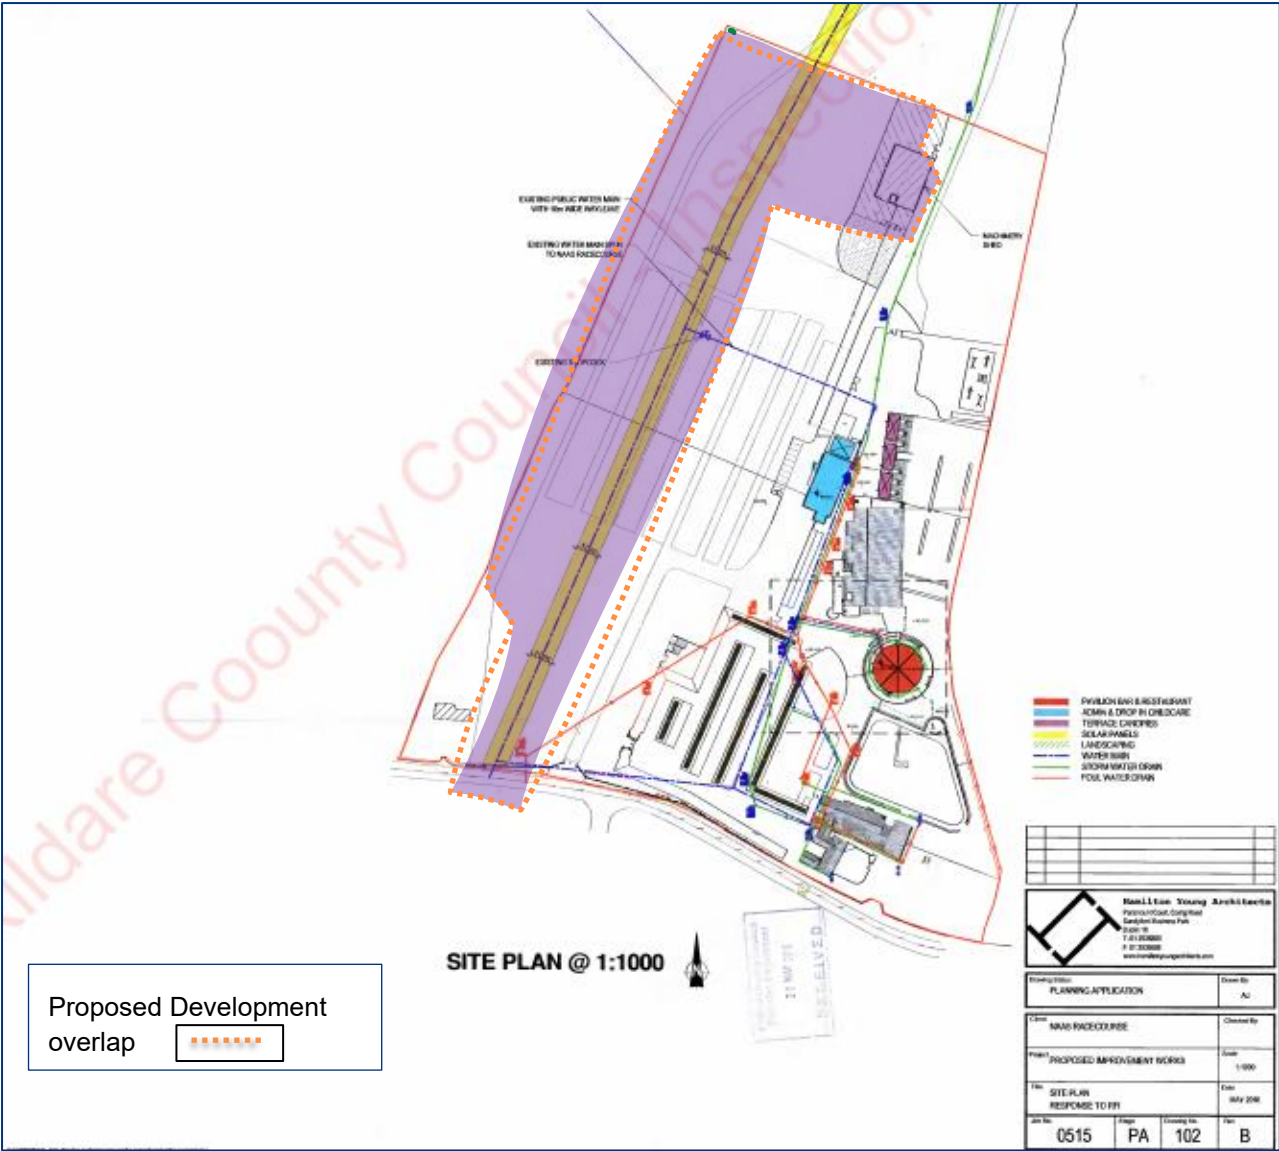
Site Layout Plan KCC Ref. 16/217
